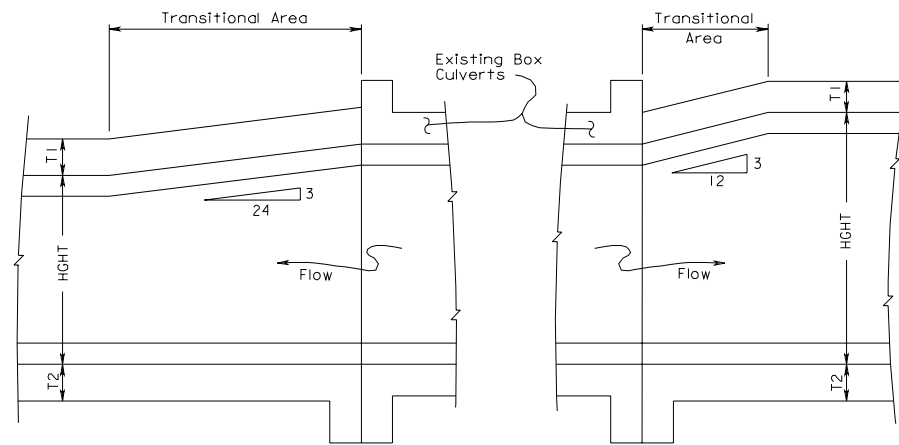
DETAILS FOR WIDENING EXISTING BOX CULVERTS
